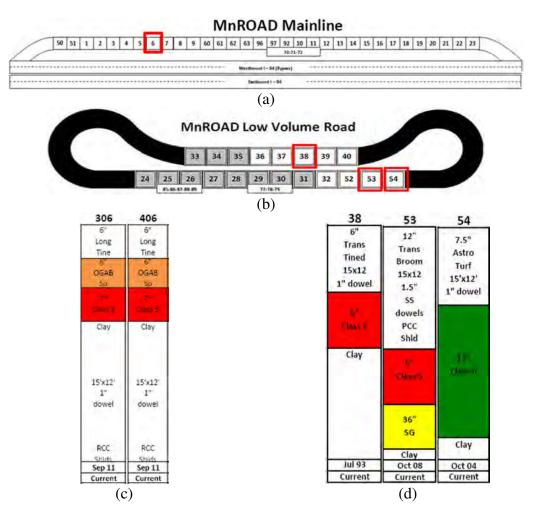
Layout of MnROAD (a) mainline and (b) low-volume road segments and pavement cross sections for (c) Cells 306 and 406 and (d) Cells 38, 53 and 54 (Courtesy of MnROAD Research Website: http://www.dot.state.mn.us/mnroad/).
